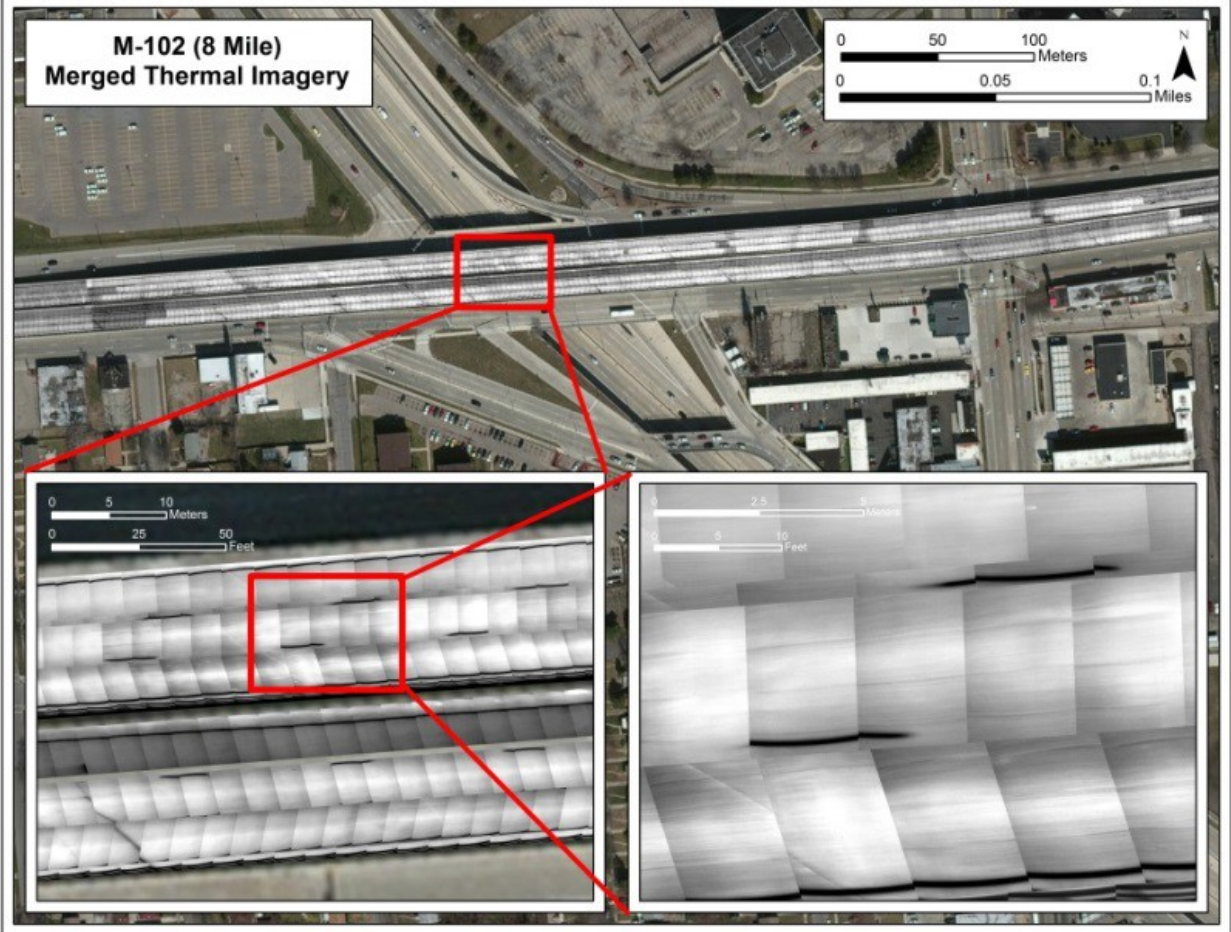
RED Epic imagery merged together to form spall locations on the bridge deck of M-102 (8 Mile) eastbound and westbound.
